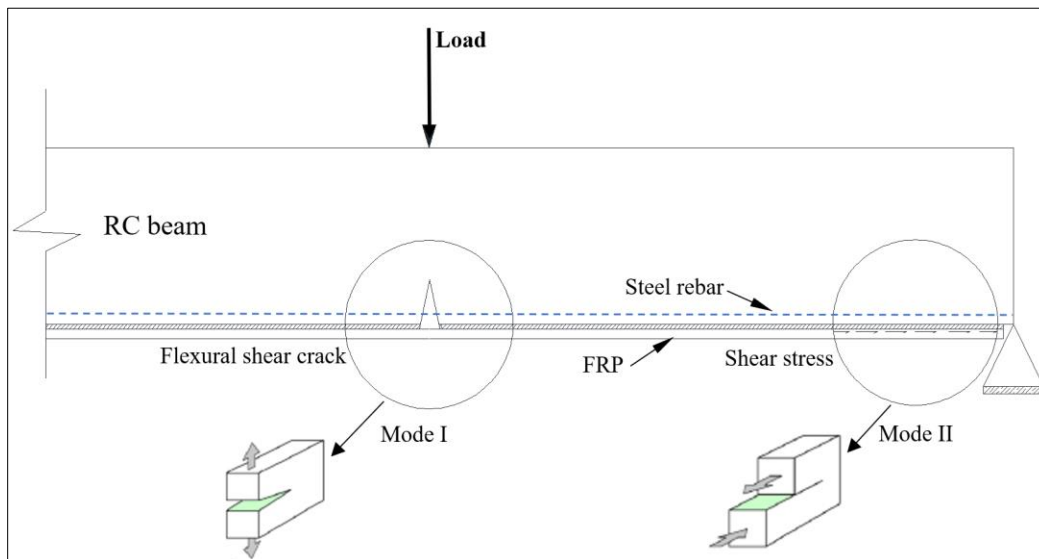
Cracking mode of an EB-FRP strengthened RC beam
